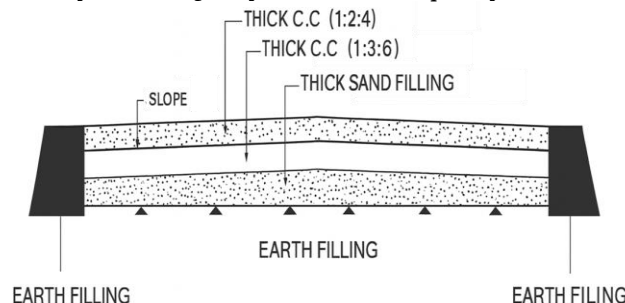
Cross-section of a cement concrete (CC) road constructed in hard soil conditions
